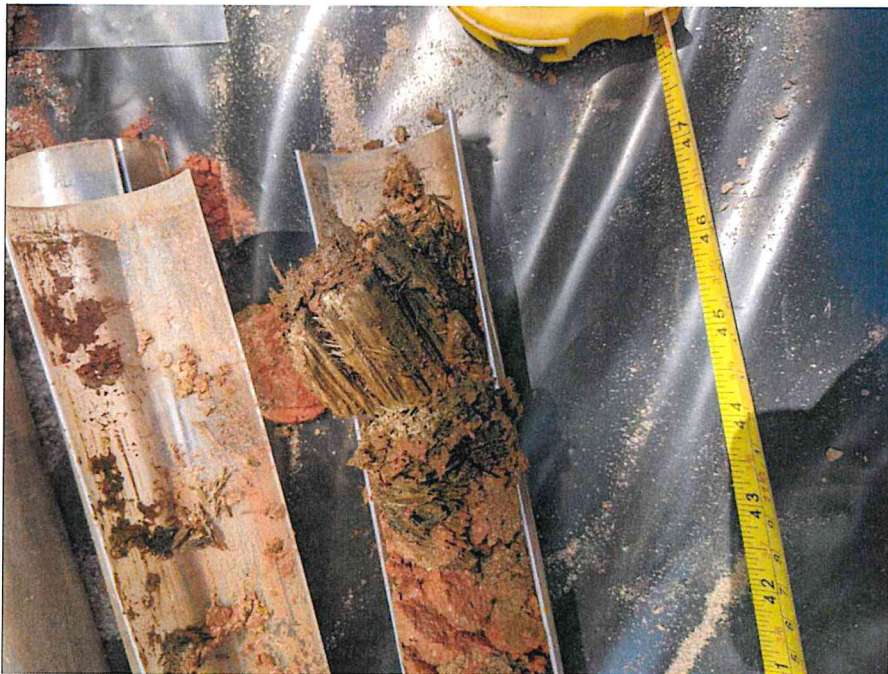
View of wood found at refusal depth at boring SB16 (facing northwest)
